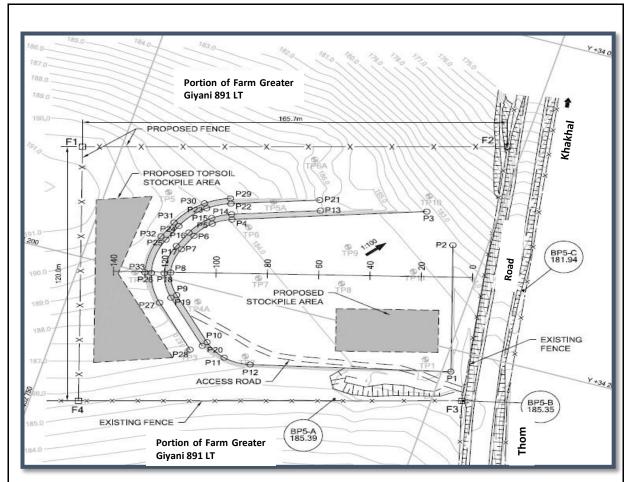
Proposed Layout of Borrowpit and Extract of the mining Plan
